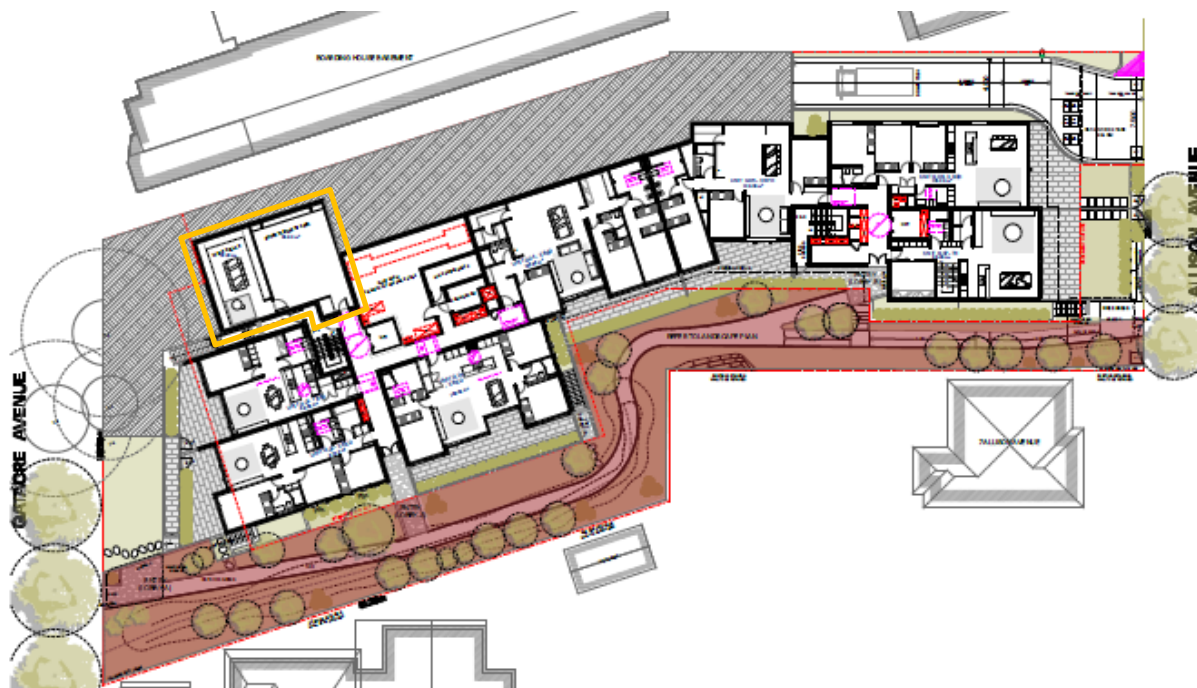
Extract of Ground Floor Plan showing Communal Areas
